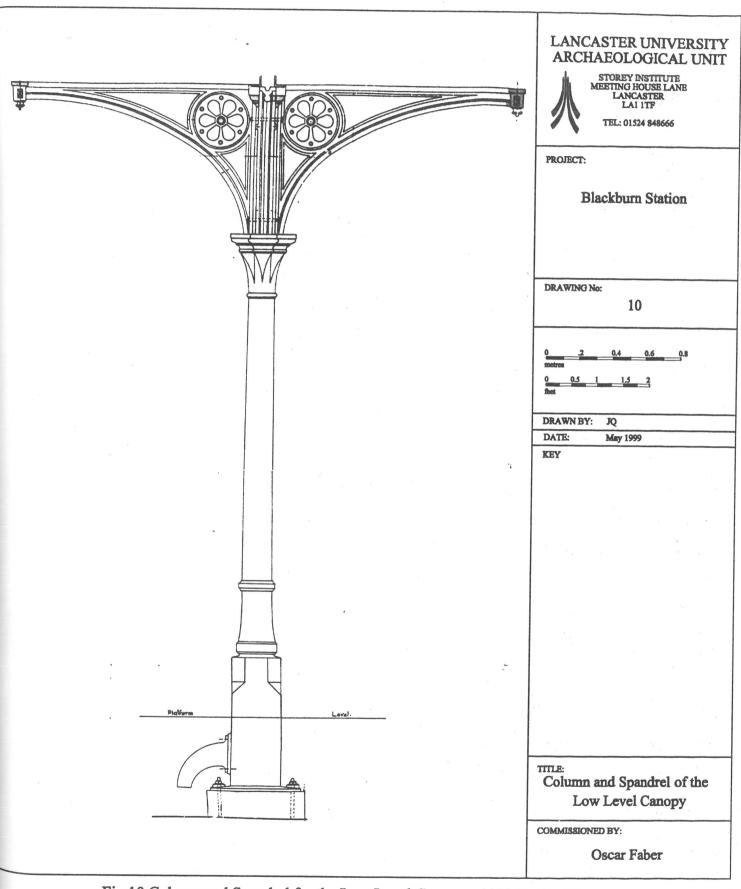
Column and Spandrel for the Low Level Canopy - 1888 Design Plan
